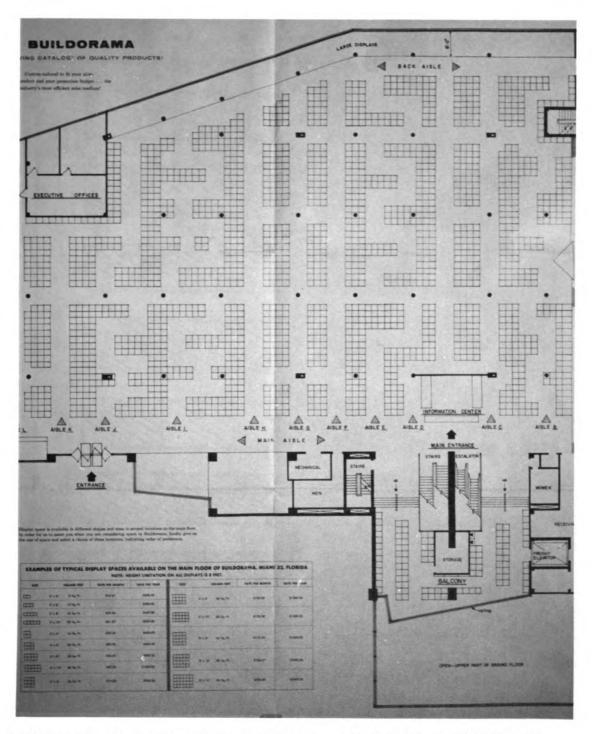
Floorplan of the Buildorama, showing the modified grid arrangement.
